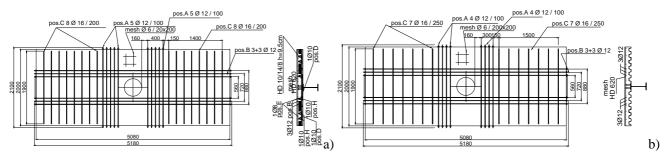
Slab reinforcement of a) a prefabricated lattice girder slab, b) a profiled steel sheeting slab
